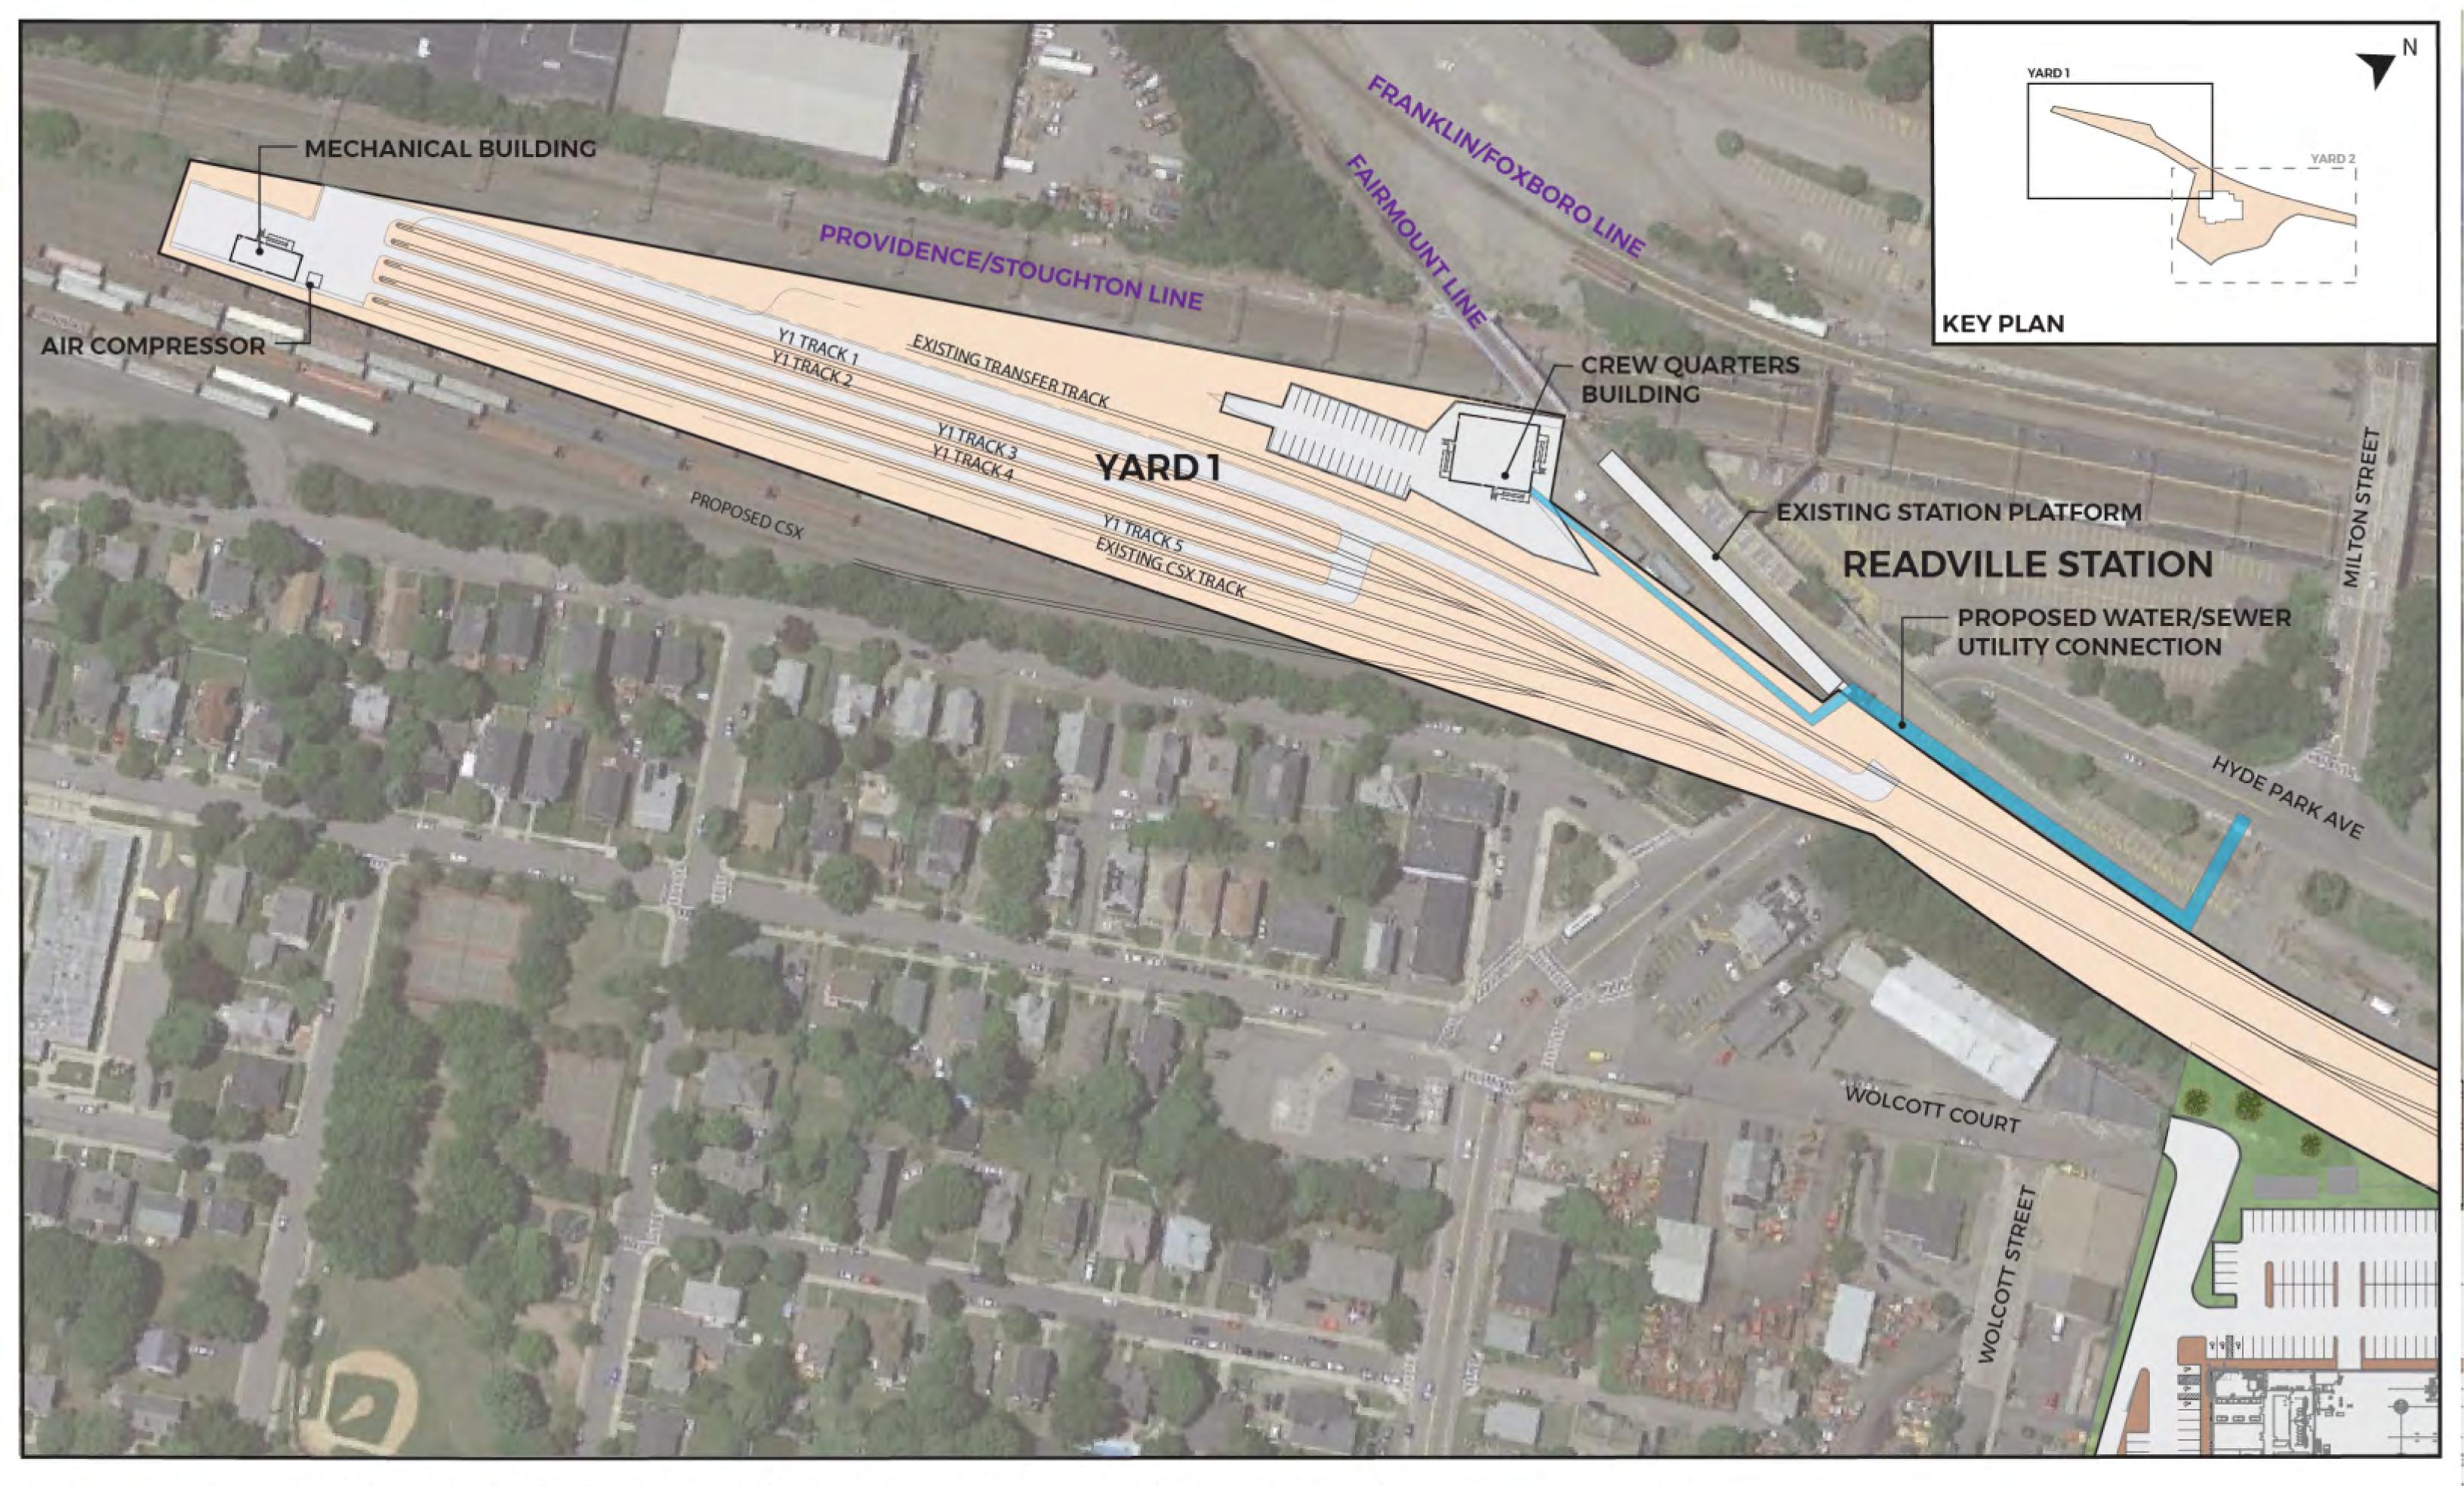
SOUTH SIDE MAINTENANCE AND LAYOVER FACILITY SCHEMATIC SITE PLAN - YARD 1
